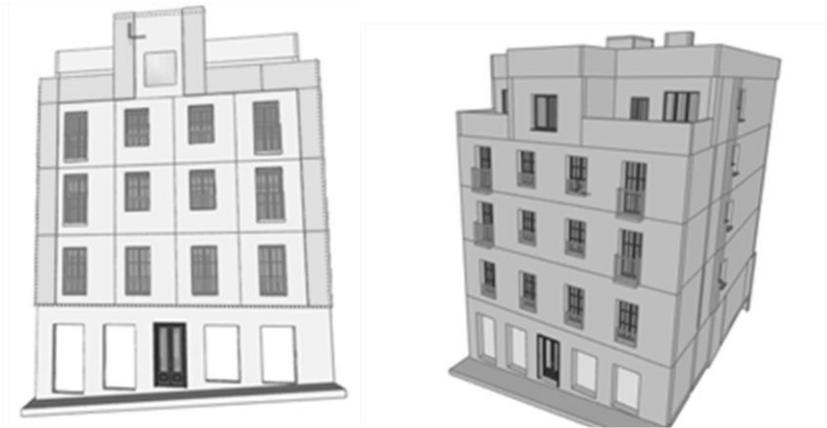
Building BIM model and configuration of the timber modules with RenoBIM
